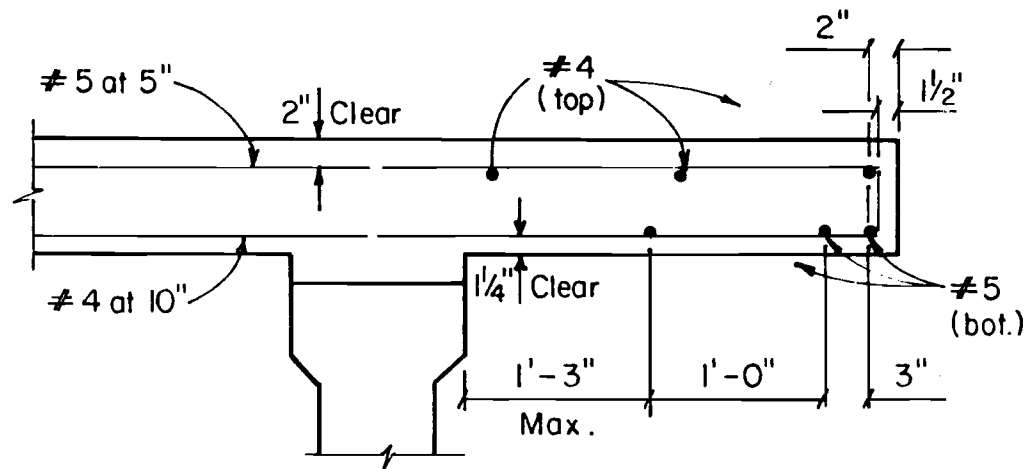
Typical Texas SDHPT slab overhang detail
